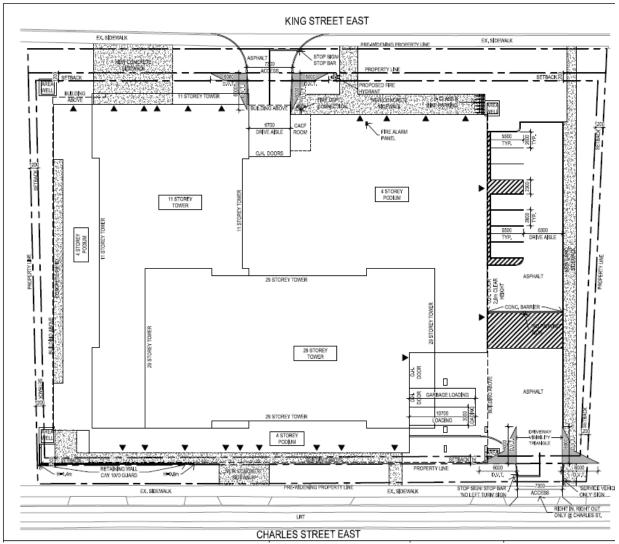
Site Plan of Proposed Development (Source: Reinders + Law, 2023)
